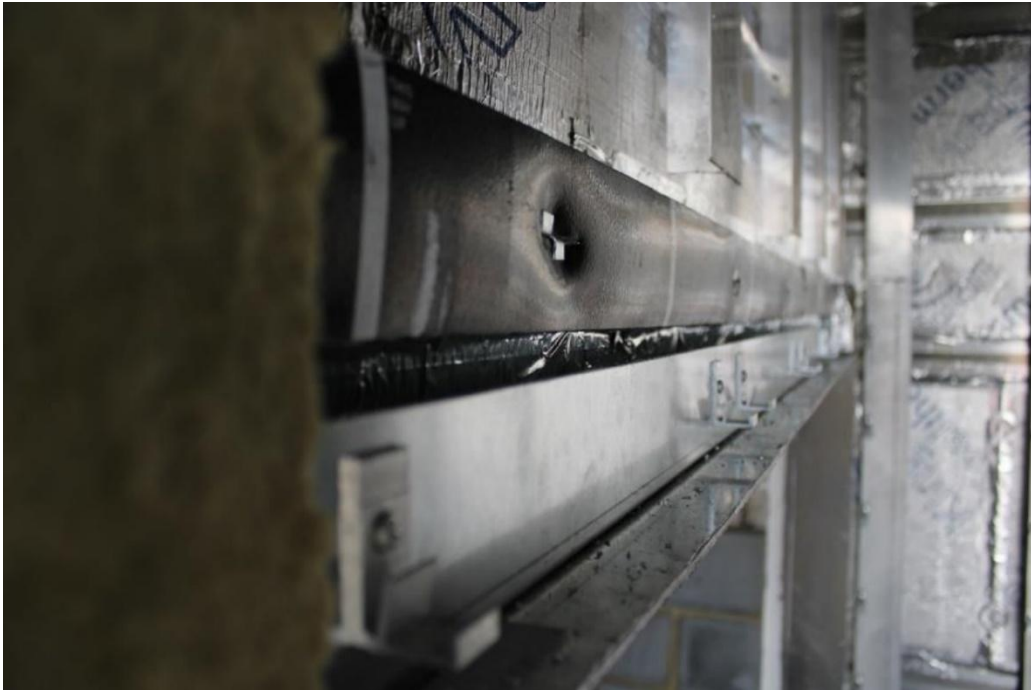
'L'-shaped angle fixed to combustion chamber flashing top edge.
